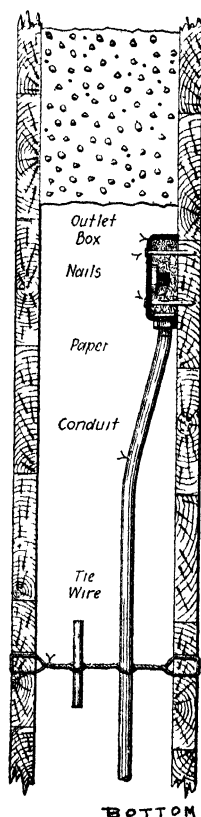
Showing methods of supporting conduit and outlet box in vertical wall-form.
